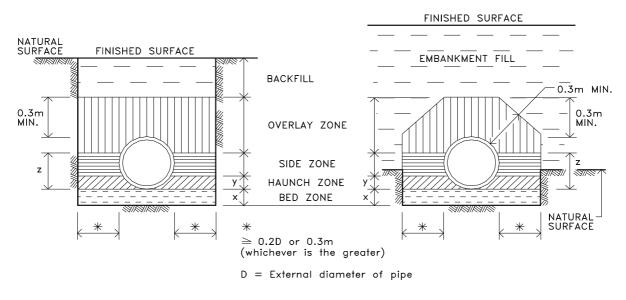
and Table 3.1 indicate the dimensions of bedding and backfilling for pipes laid in trench conditions and embankment conditions for all AS 3725 pipe support types.
